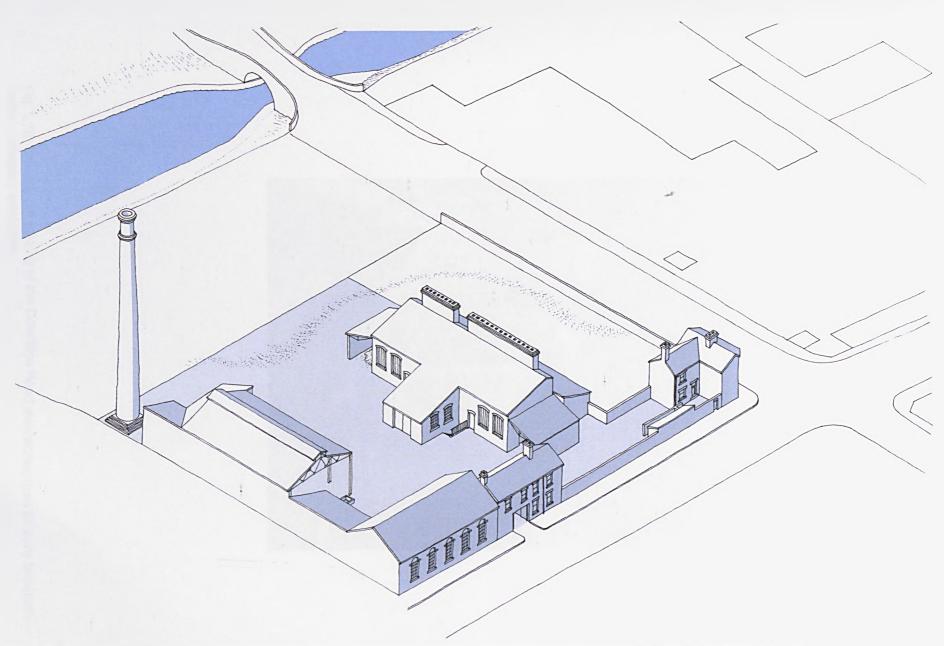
Isometric reconstruction of the Coleridge Road steelworks as built, with the relocated porter's house. Scale 1:500 (author).
